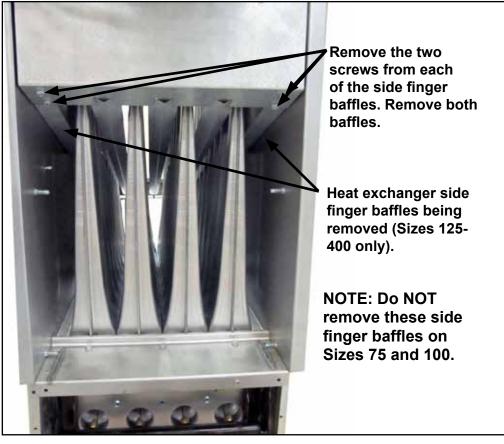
Discharge Air End of the Heat Exchanger showing the Baffle Assembly to be Removed
